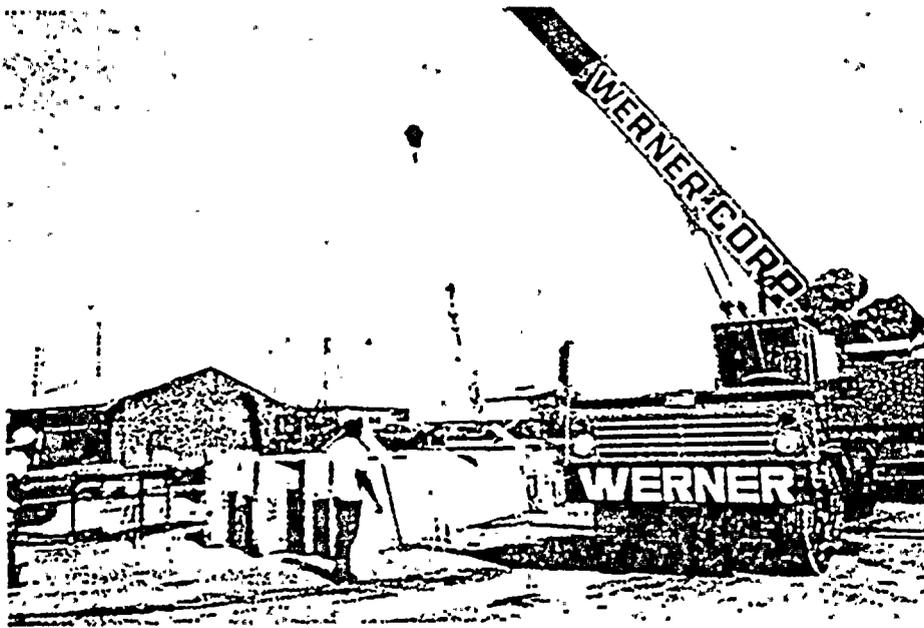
Moving Tilt-Up Concrete Panels to Storage Area.
